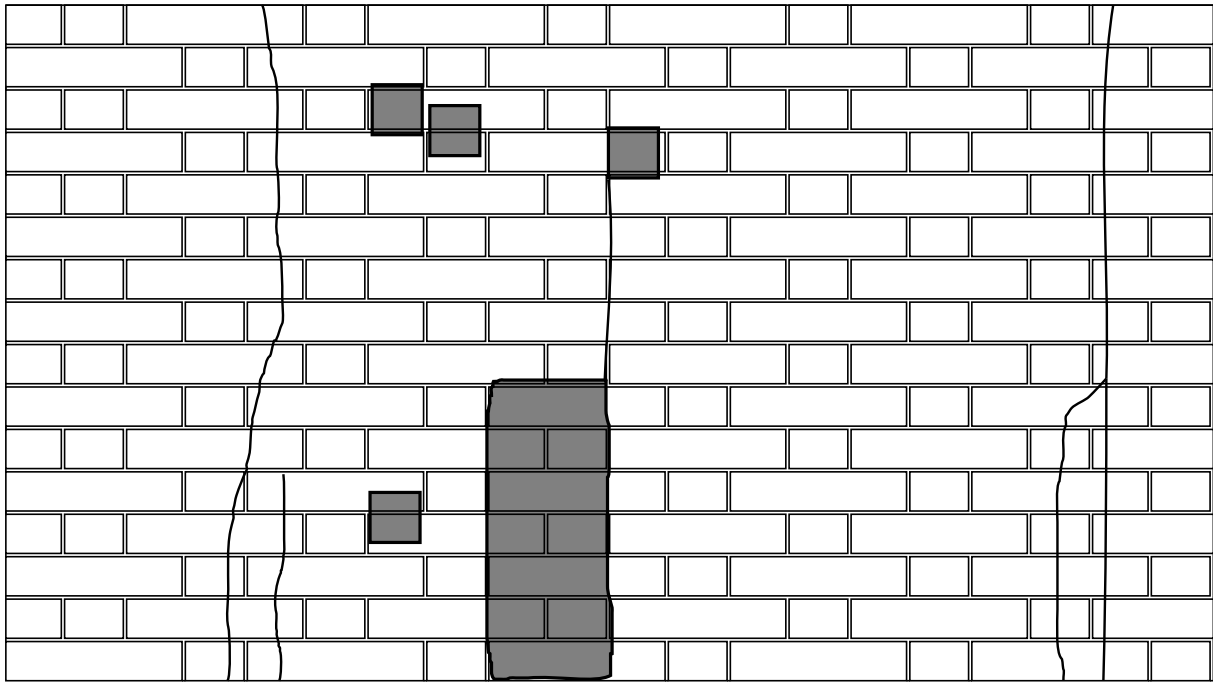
Survey of existing damage on masonry pillar. Large vertical cracks and spalling area near the base are visible.
